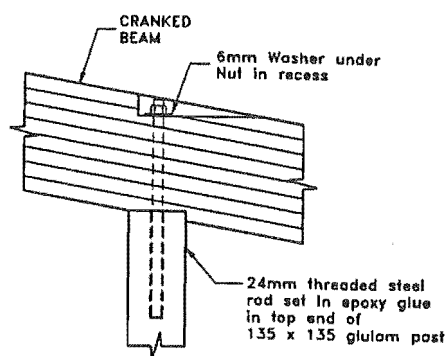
Beam-column connection used in timber classrooms (McIntosh, 1989)
